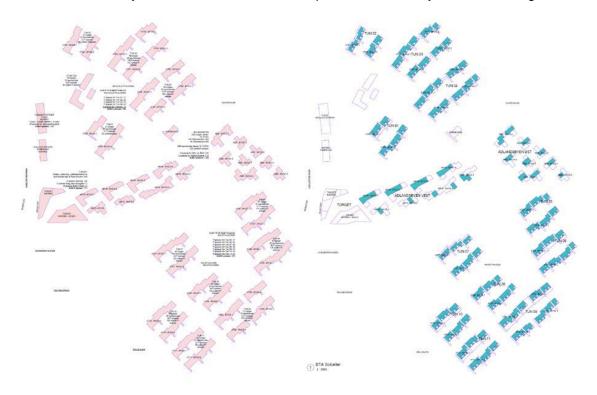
Graphical overview of left) floor area of buildings and right) roof area for solar cells. Image: Snøhetta.
